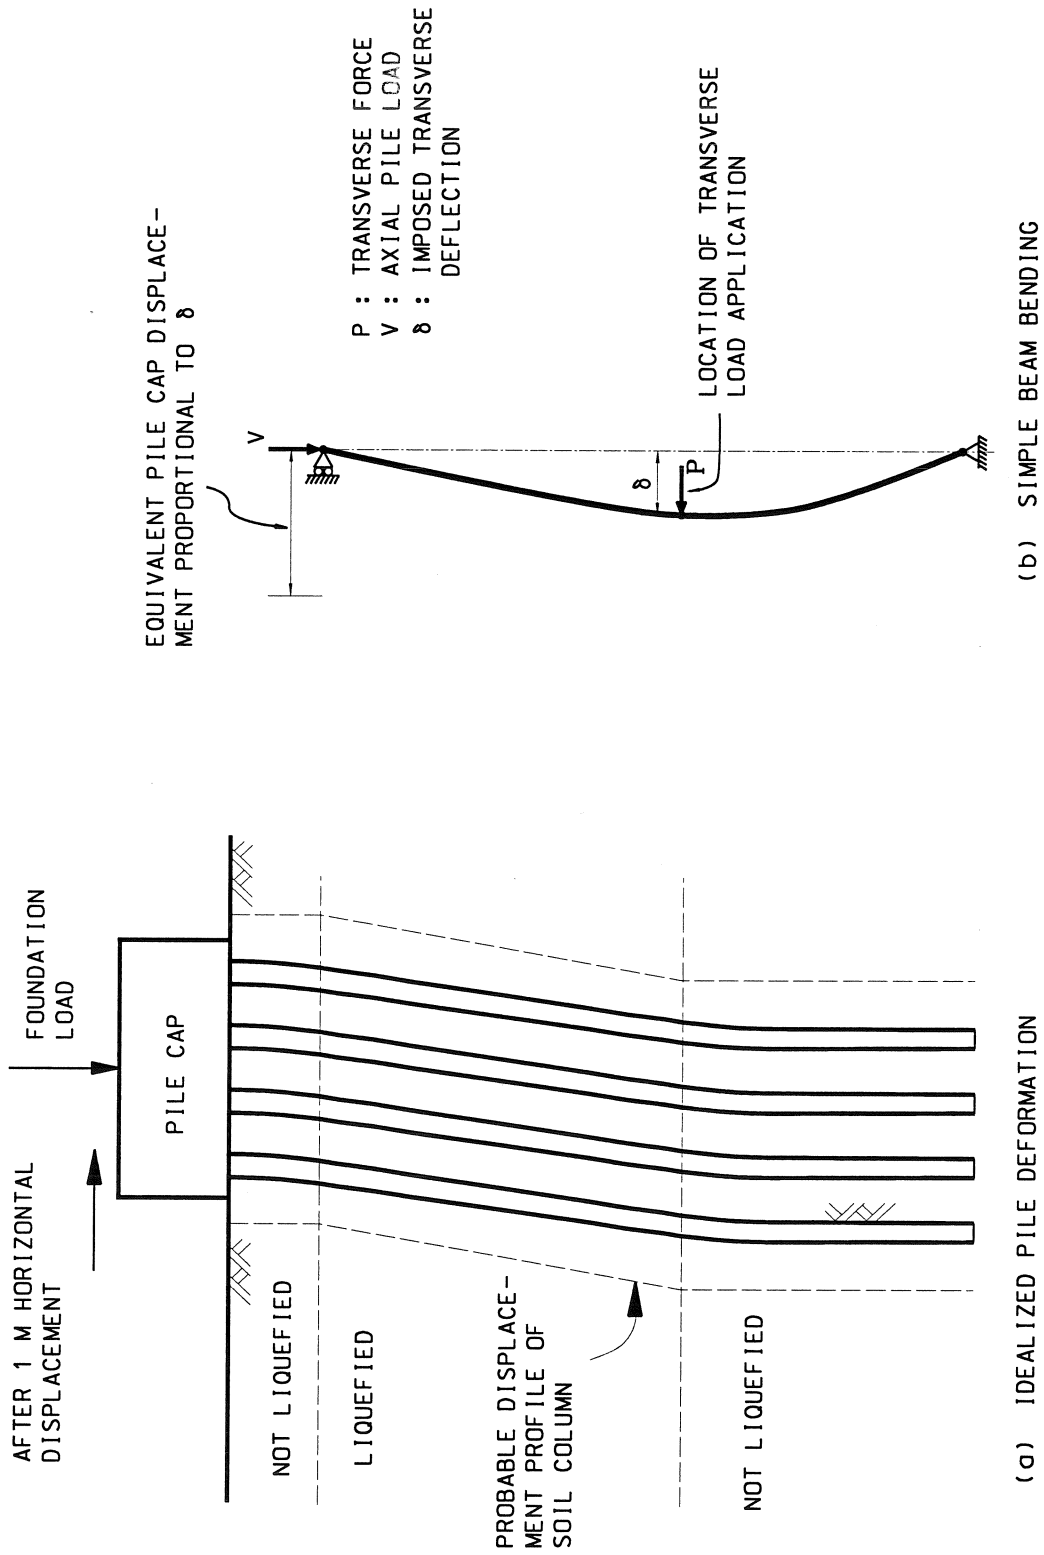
MODELLING PILE DEFORMATION IN LABORATORY TEST
